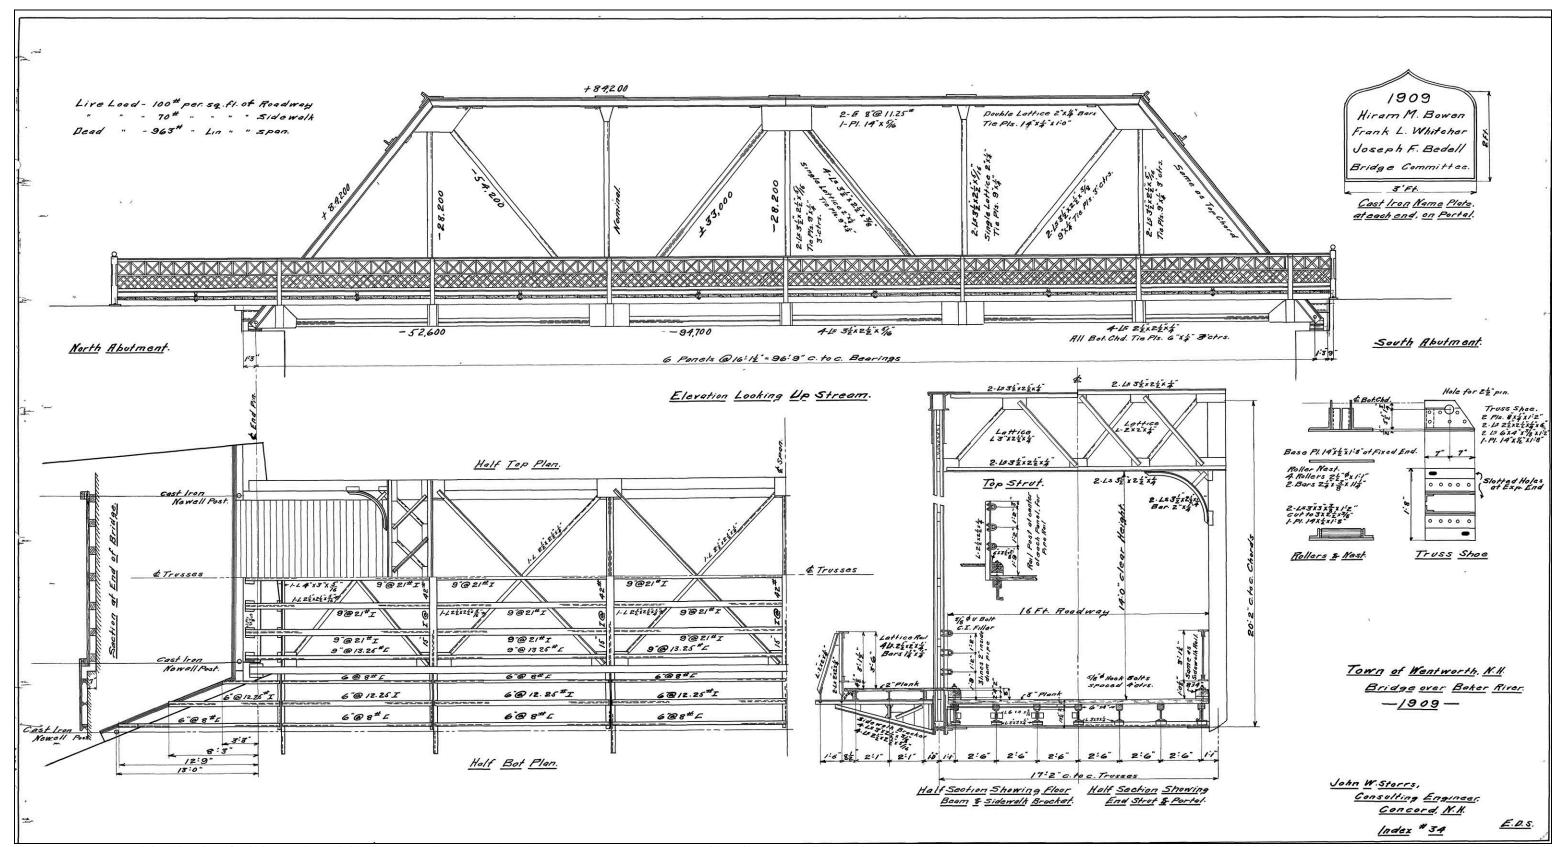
Original drawing of existing steel truss bridge (Wentworth 148/121), by John W. Storrs (Source: NHDOT Bridge Files).
